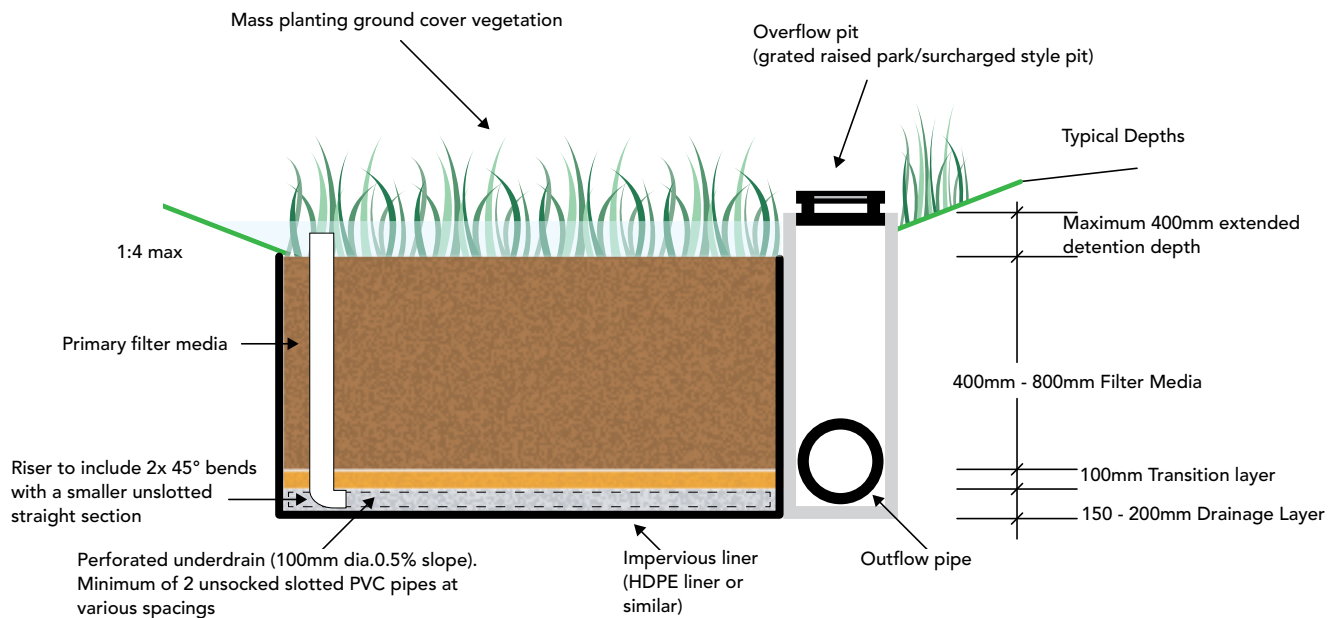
Long cross section of a typical bio-retention system (basin, cell, raingarden)
